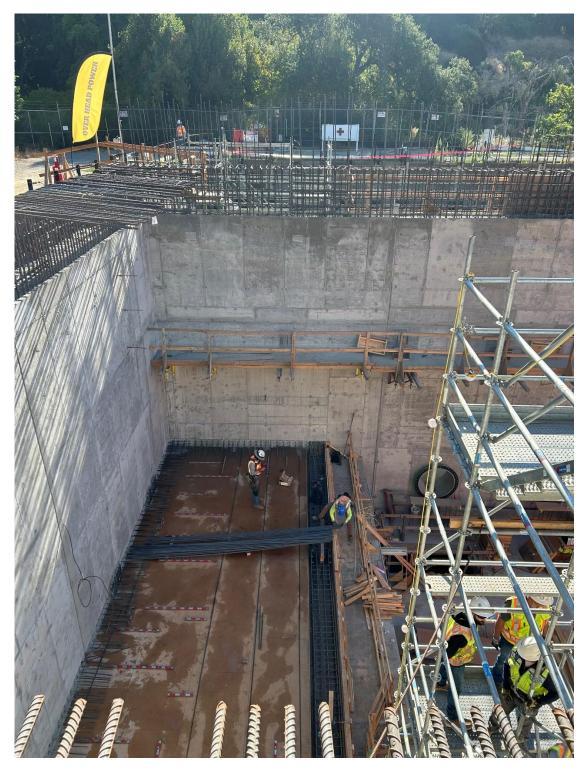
Installation of wooden forms for the mezzanine level in the UV Room.
